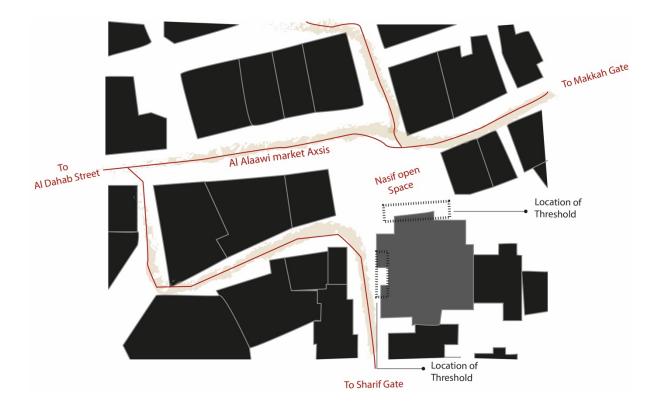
Site plan showing Nassif house and the surrounding houses. Source: Author.
